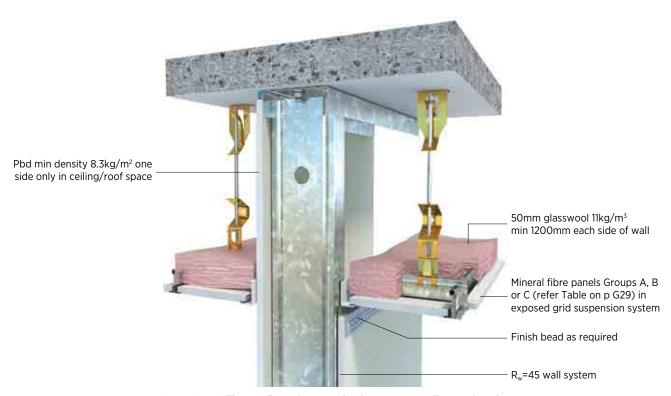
Ceiling configuration to maintain an  $R_w$ =45 wall acoustic rating (System OP.8 shown)
